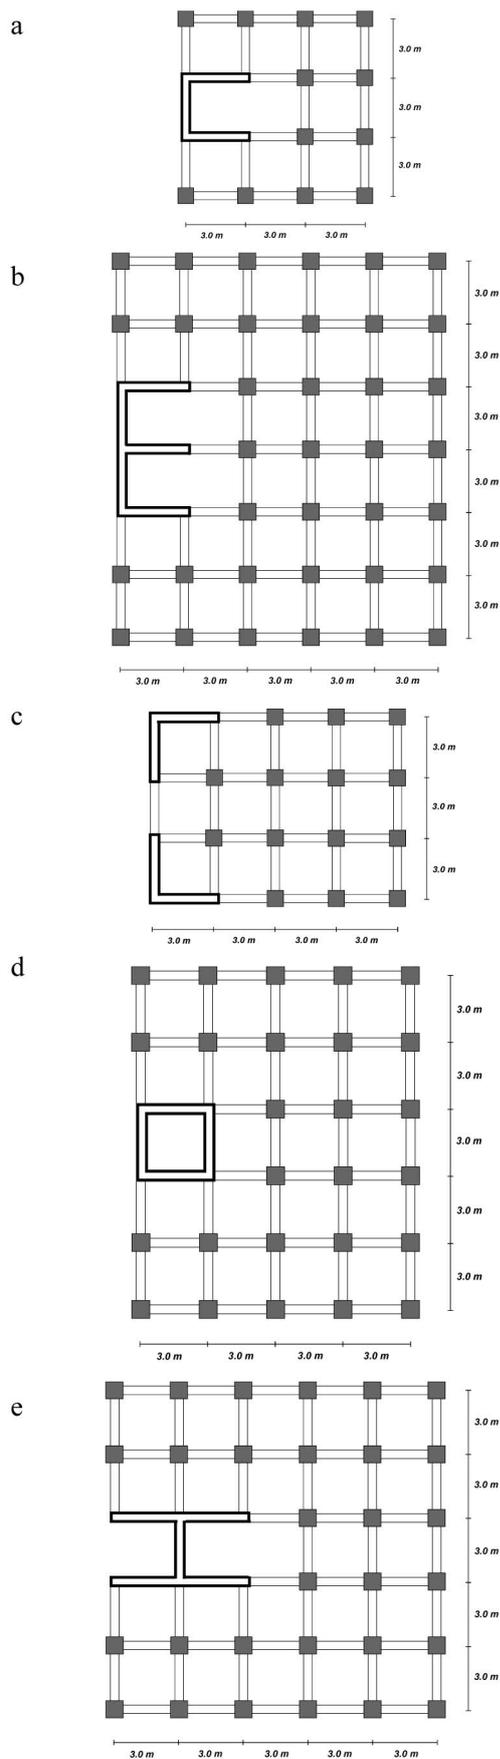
Floor Plan of the Building Structures (a) BS1, (b) BS2, (c) BS3, (d) BS4, and (e) BS5
